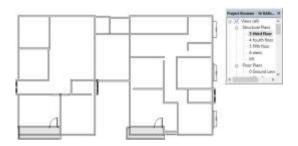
Building The Walls Of The First Floor And Specify The Building Levels.
